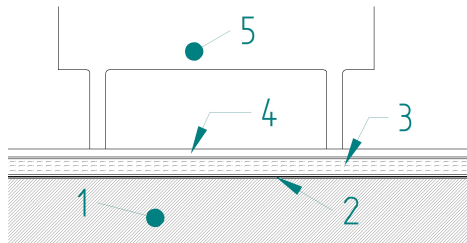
1.concrete roof; 2.bitumen water sealing; 3.rubber plates layer; 4.alloy plate; 5.19-inch rack.
